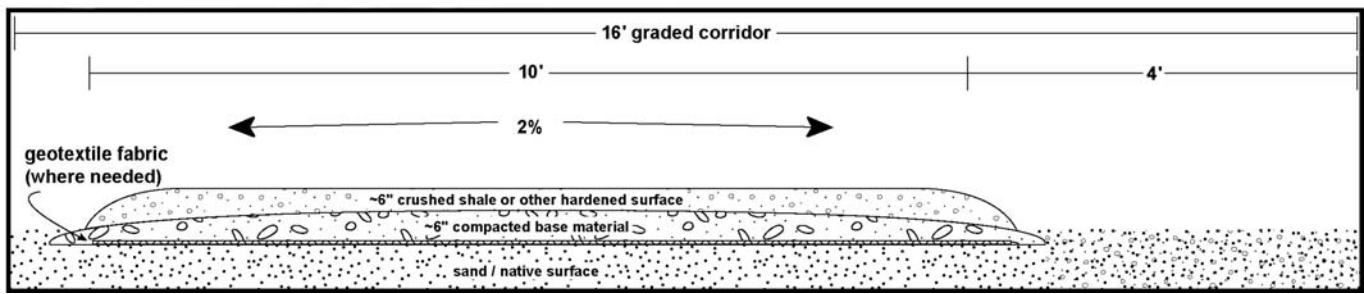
Proposed Typical Elk River Trail Cross-Section.
